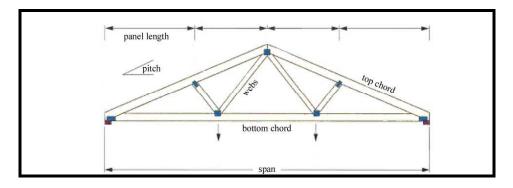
Typical truss members and definitions in truss design (MiTek Solutions, document online).
